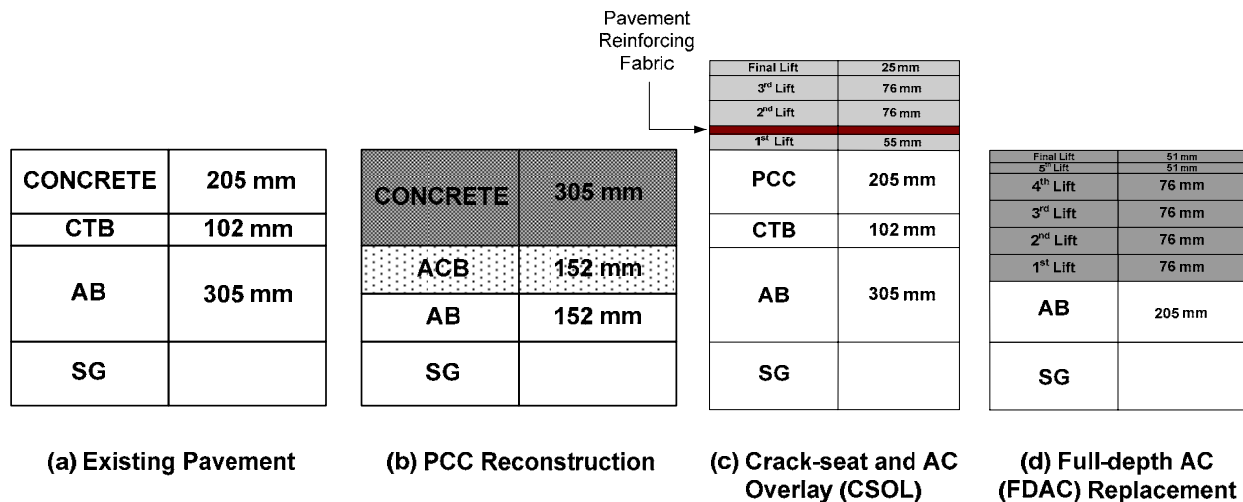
Examples of typical pavement cross-section changes in the CA4PRS model
